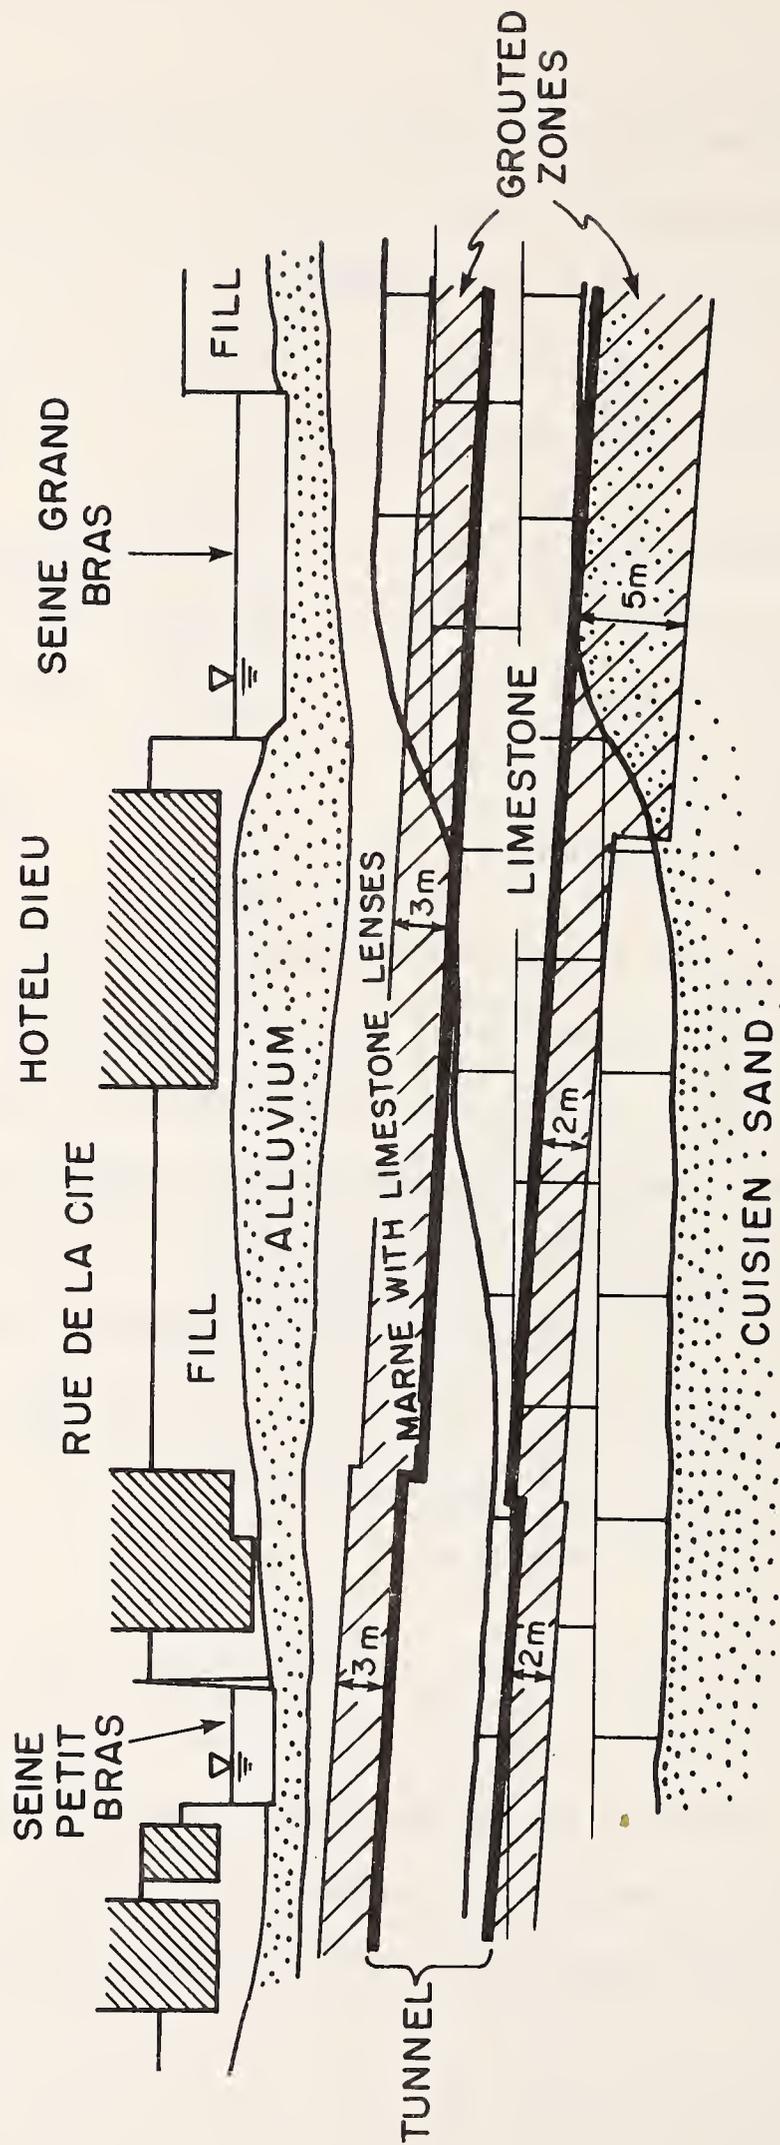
GROUTING ZONES FOR SEINE TUNNEL CROSSINGS, PARIS METRO (COURTESY SOLETANCHE, S.A., PARIS, FRANCE)
